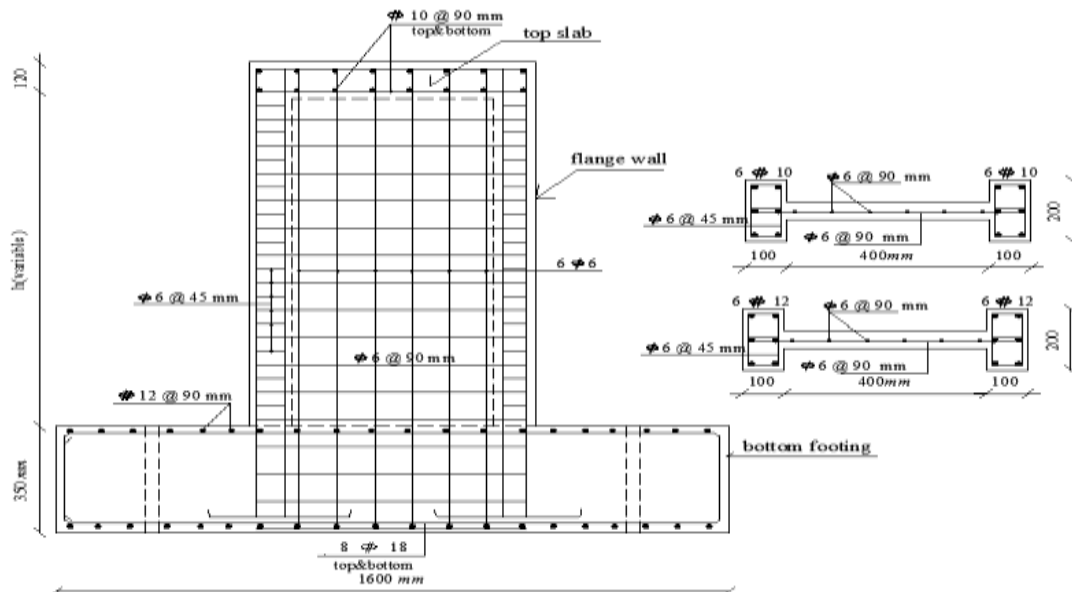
Concrete Dimensions and Reinforcement Details for Group (1) and Group (2)
